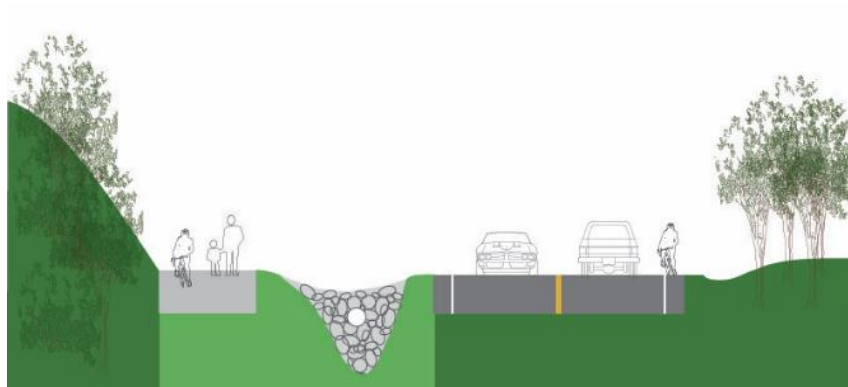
ALTERNATIVE 2 NORTH OF MOUNTAIN VIEW ROAD
